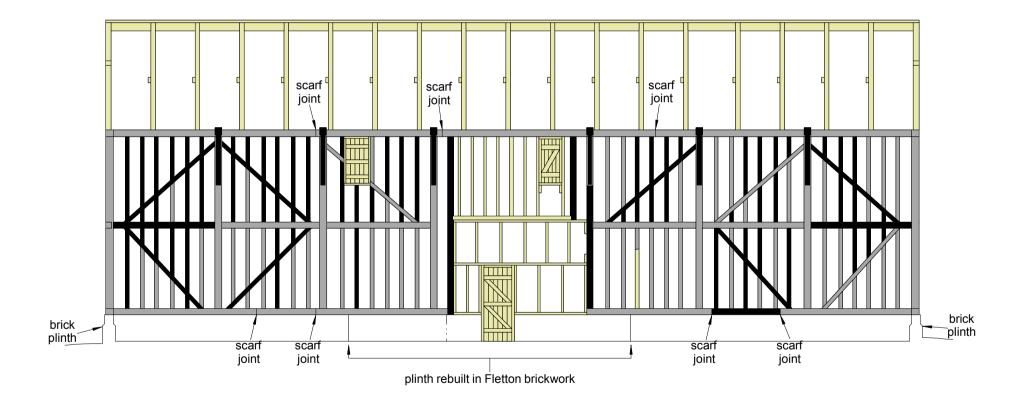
Frame drawing of south-east elevation, indicating the locations of original, re-used and replacement timbers.
